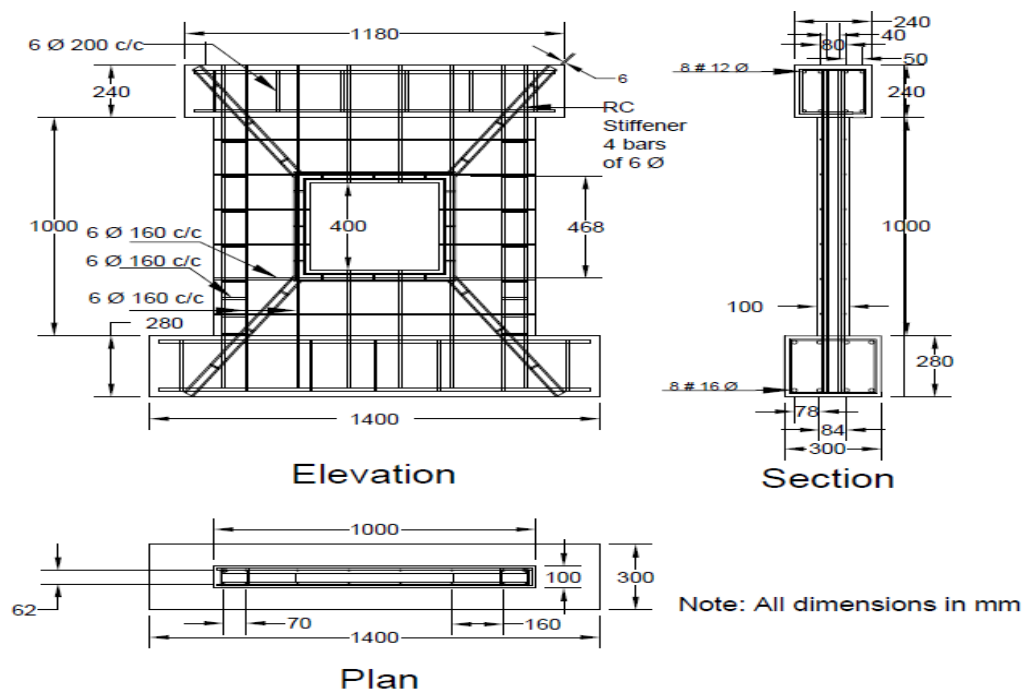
Shear wall with an opening using RC stiffeners (OPRC)
